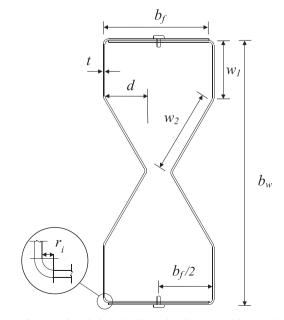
Definition of symbols for built-up closed section with inward web stiffeners (V-section).
